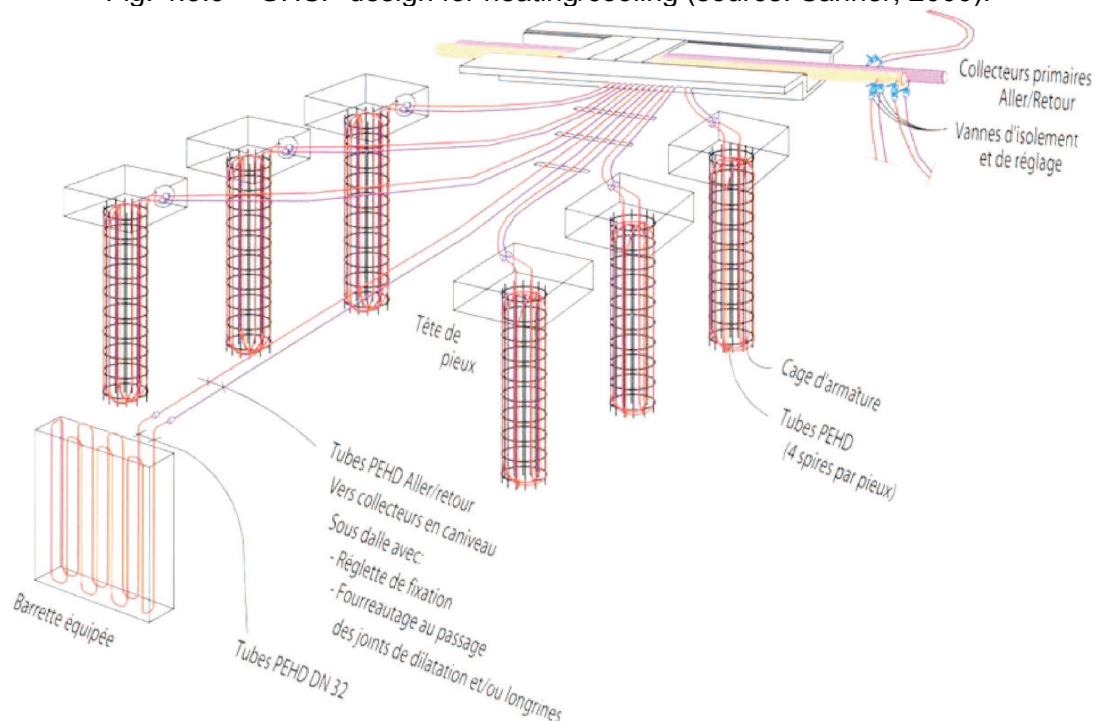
Pier type concept (source: ADEME, BRGM 2005).
